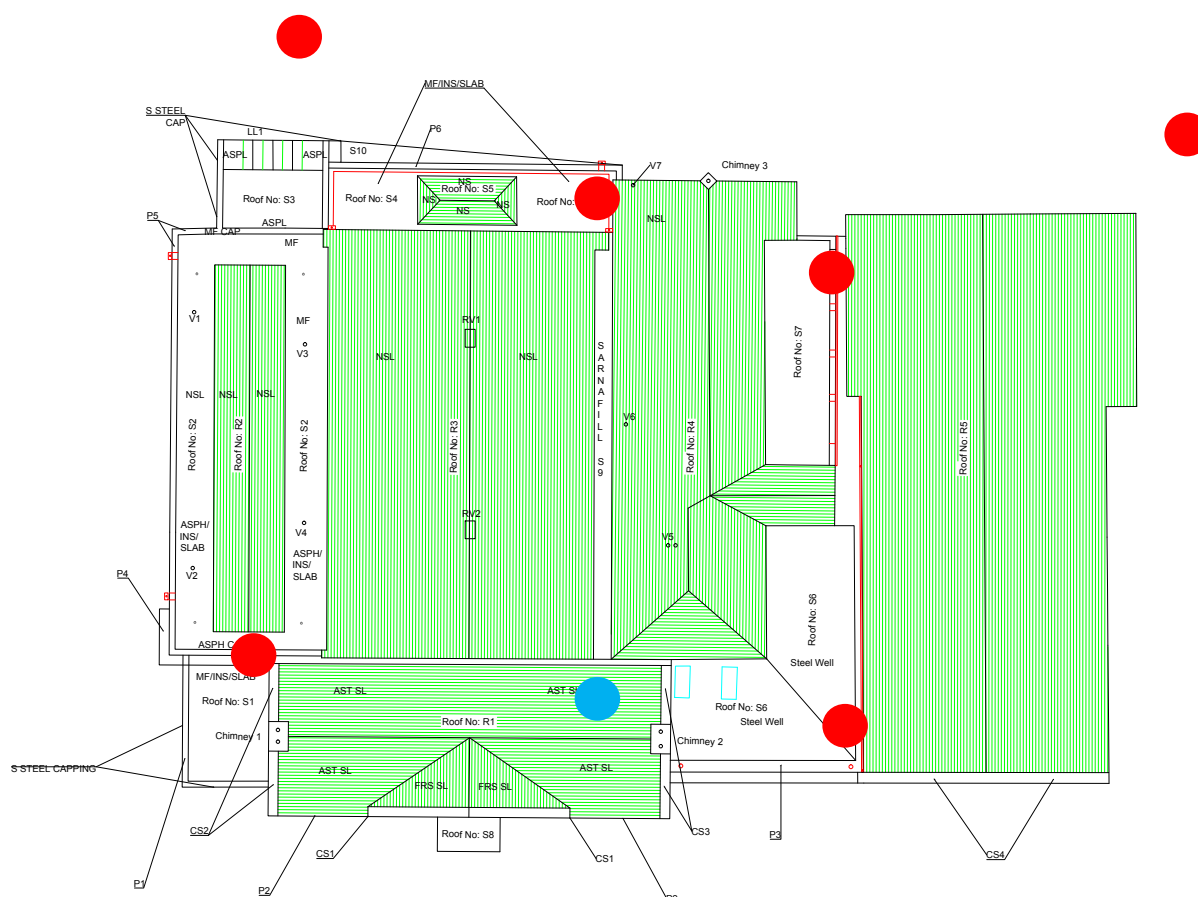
Roof plan showing proposed location of surveyors (●) and remote monitoring (●) for phase 2 ecology surveys.
